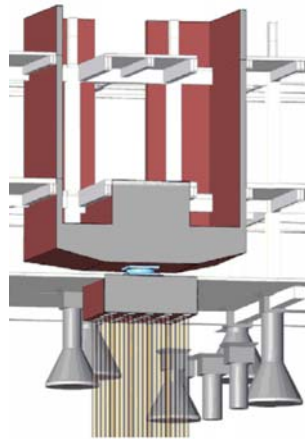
Friction pendulum bearing supporting the core wall ^[1.16]
